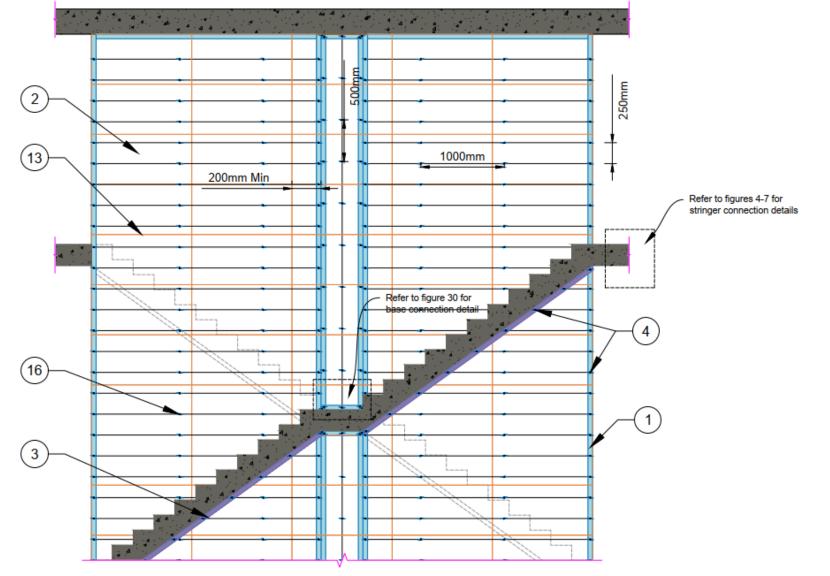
Dual wall system with vertical wall between horizontal walls - elevation view
